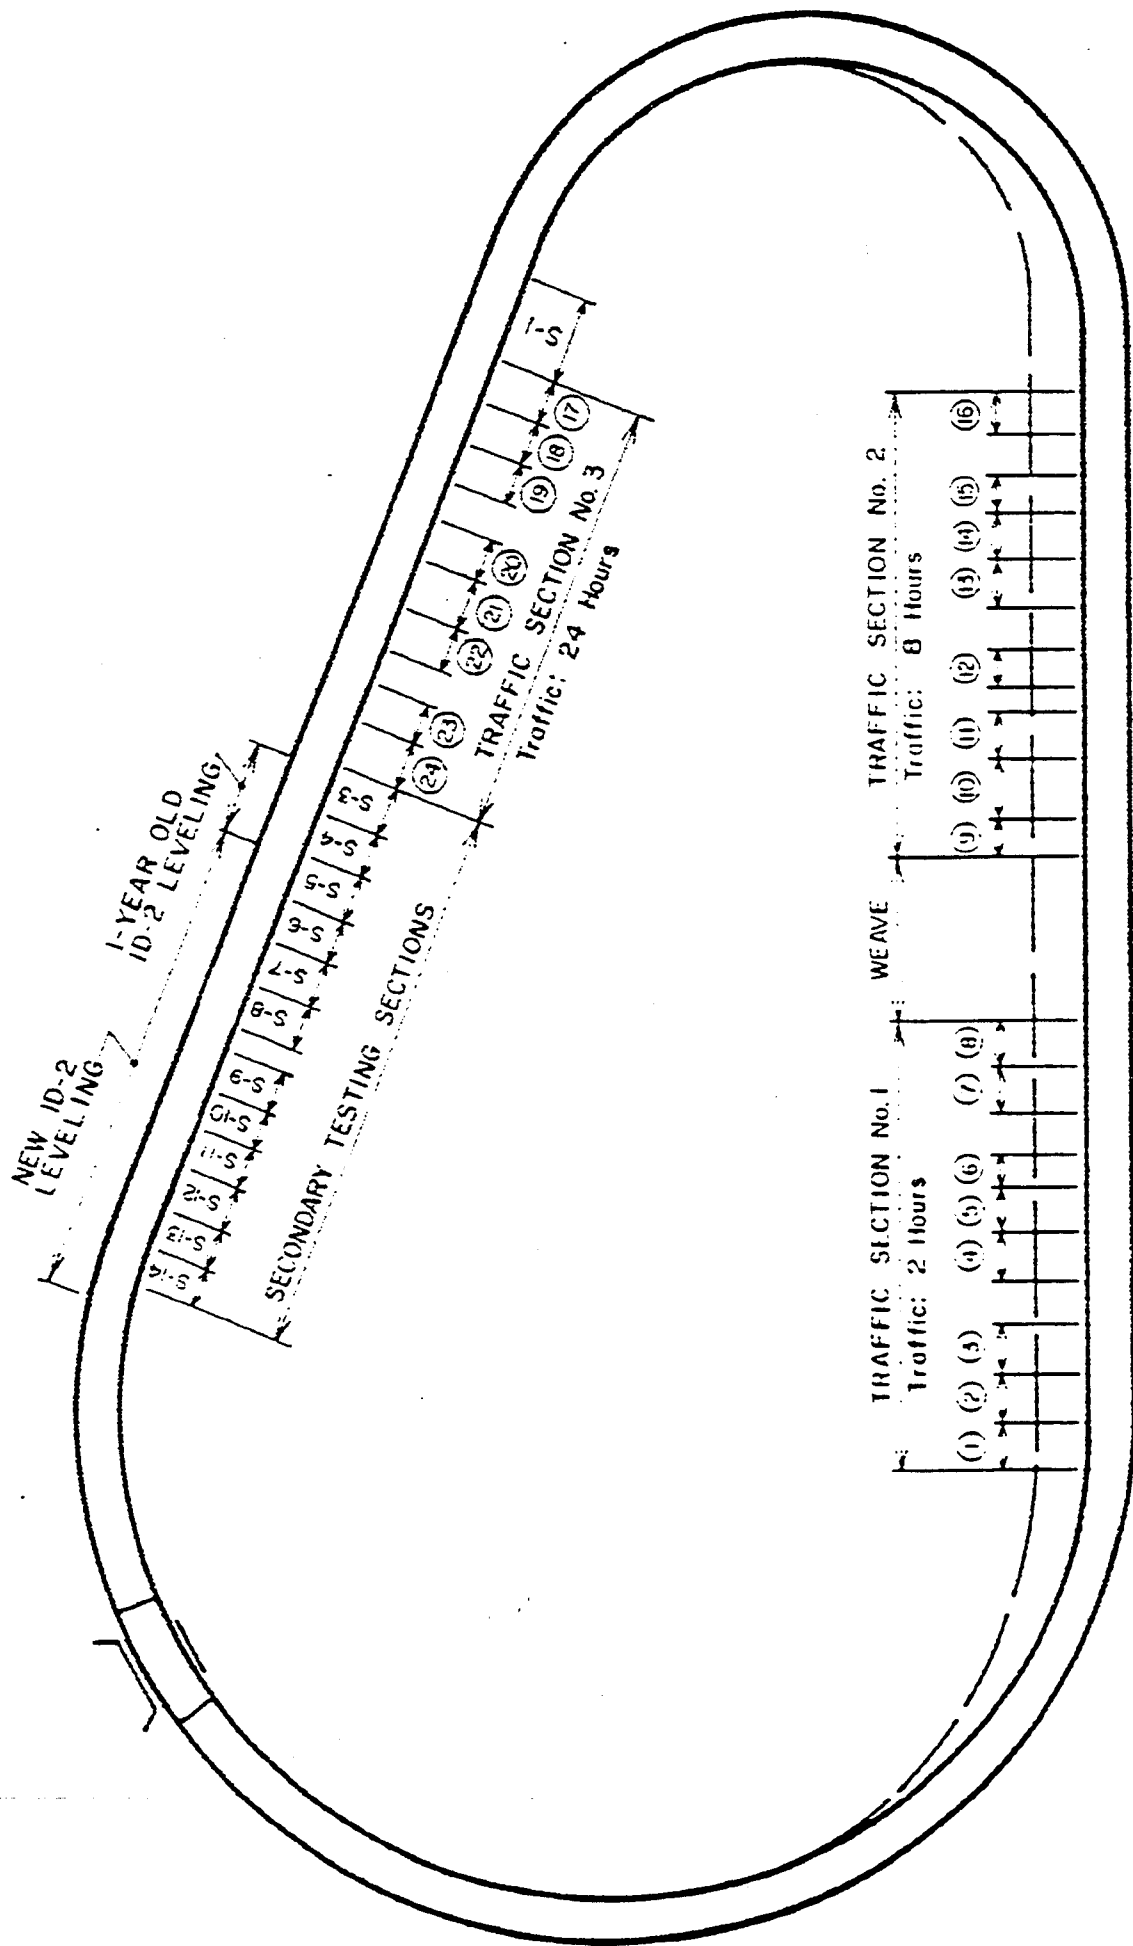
Overview of the test sections at the Pavement Durability Facility.
